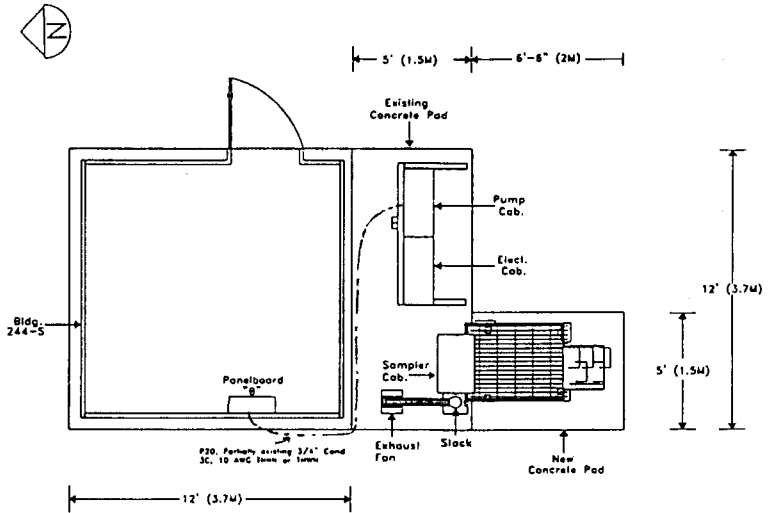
244-S DCRT GEMS Upgrade - Plan View of Equipment Layout
